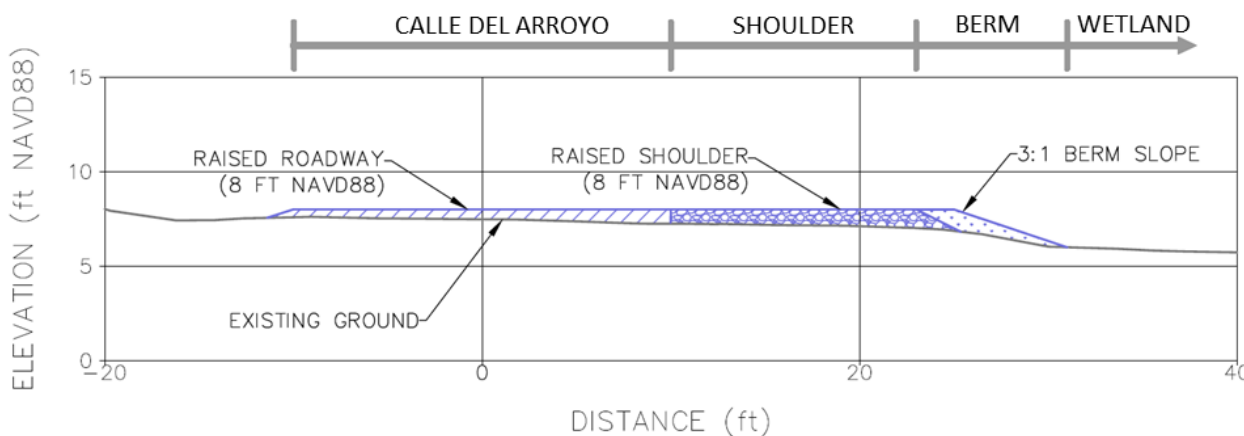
Typical cross section to raise Calle Del Arroyo, shoulder, and shoreline berm
